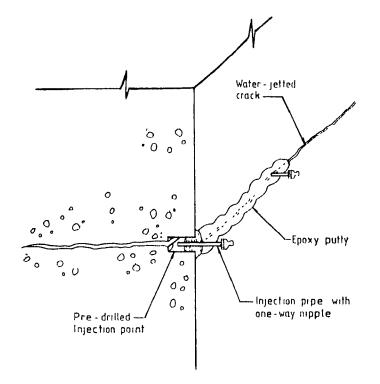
TYPICAL CRACK INJECTION SYSTEM<sup>2</sup>
